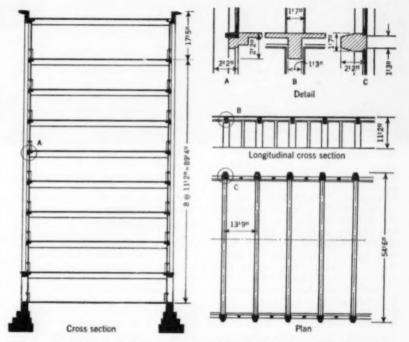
Application of prestressed concrete to multi-story laboratory building in Munich, Germany, is shown in cross sections. Black areas indicate prestressed reinforced concrete beams with end blocks so designed as to press beams against columns and thus provide necessary stiffness. Building is about 107 ft high and average story height is 11 ft. Working floor load is 120 psf.
